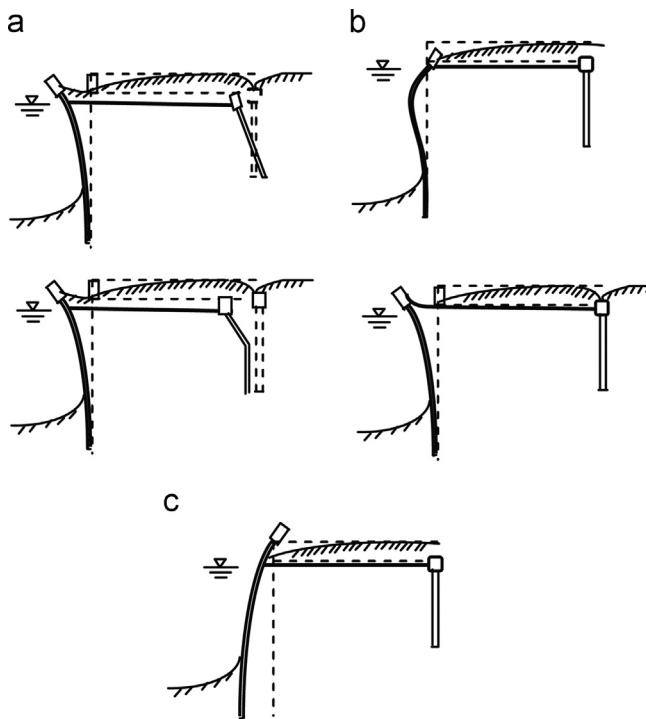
Modes of failure for a sheet pile quay wall, (a) Deformation/failure at anchor, (b) Failure at sheet pile wall/tie-rod and (c) Failure at embedment (PIANC, 2001).
